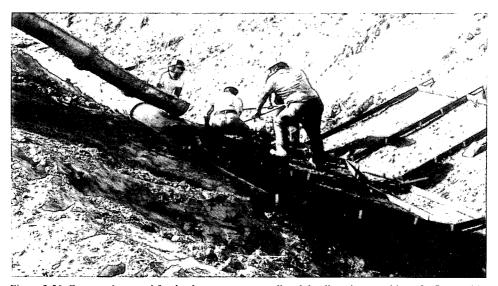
Concrete is poured for the downstream toe wall and the diverging transition of a flume with a triangular control section (Arizona).
